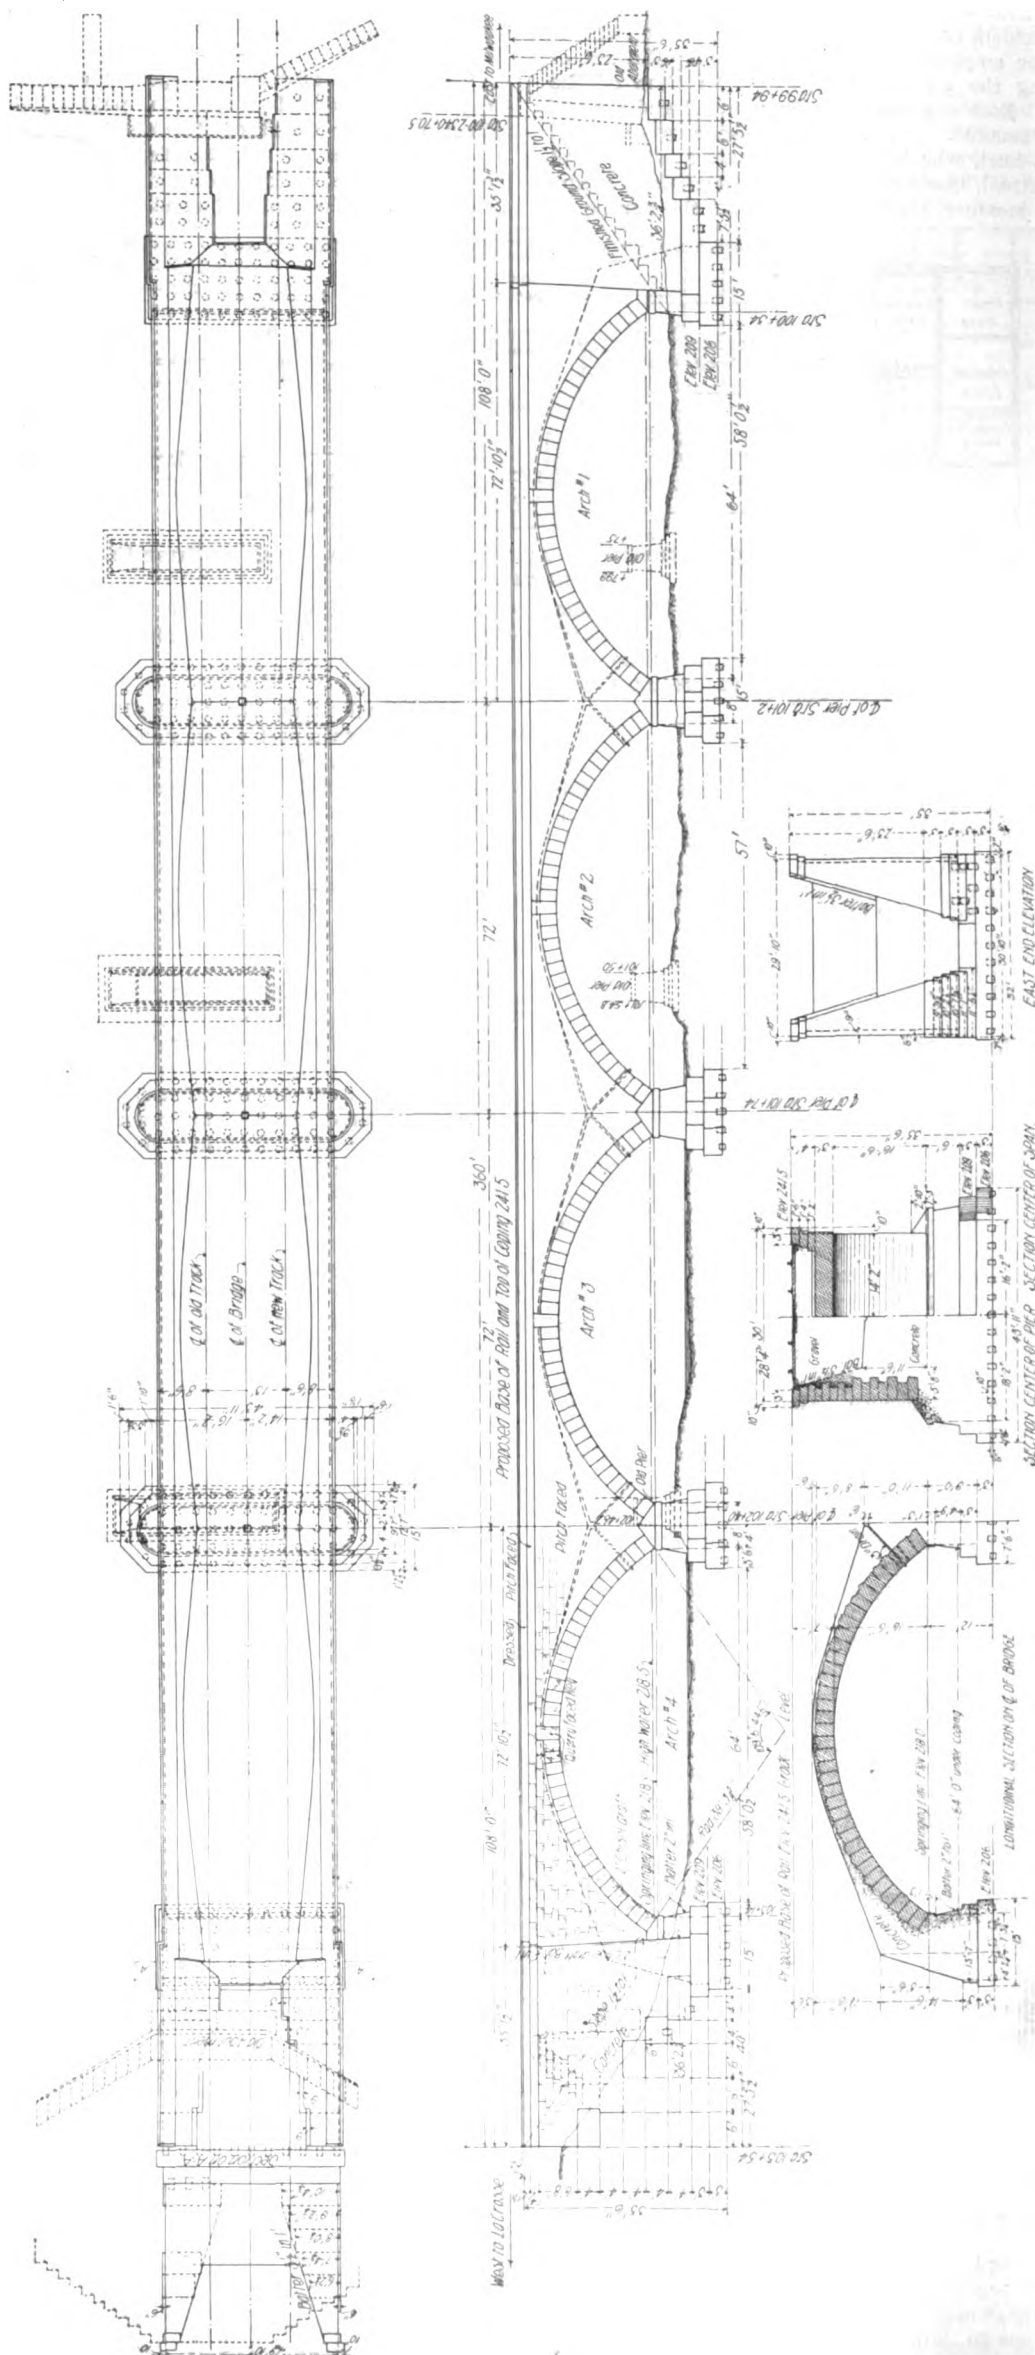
PLAN, ELEVATION AND SECTIONAL VIEWS OF STONE ARCH BRIDGE FOR THE CHICAGO, MILWAUKEE & ST. PAUL RY., AT WATERTOWN, WIS.
